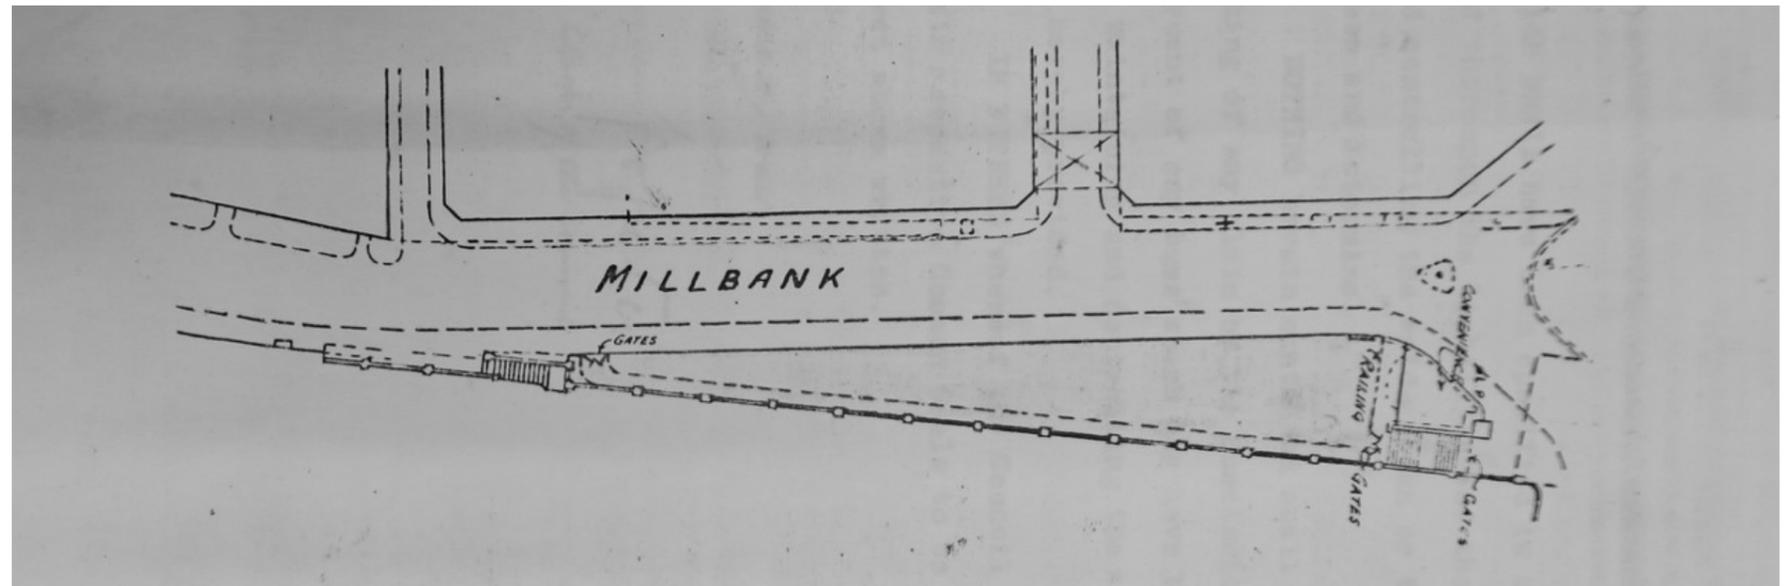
Plan of the land embanked to the south of Lambeth Bridge to form Victoria Tower Gardens South
